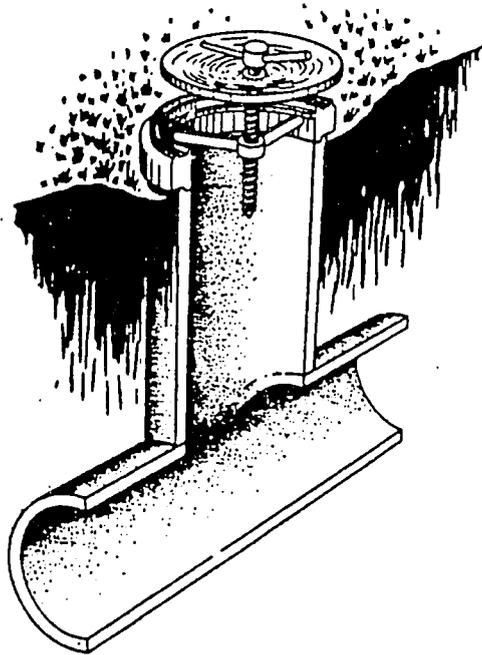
Section of an Alfafa valve mounted on concrete pipe
